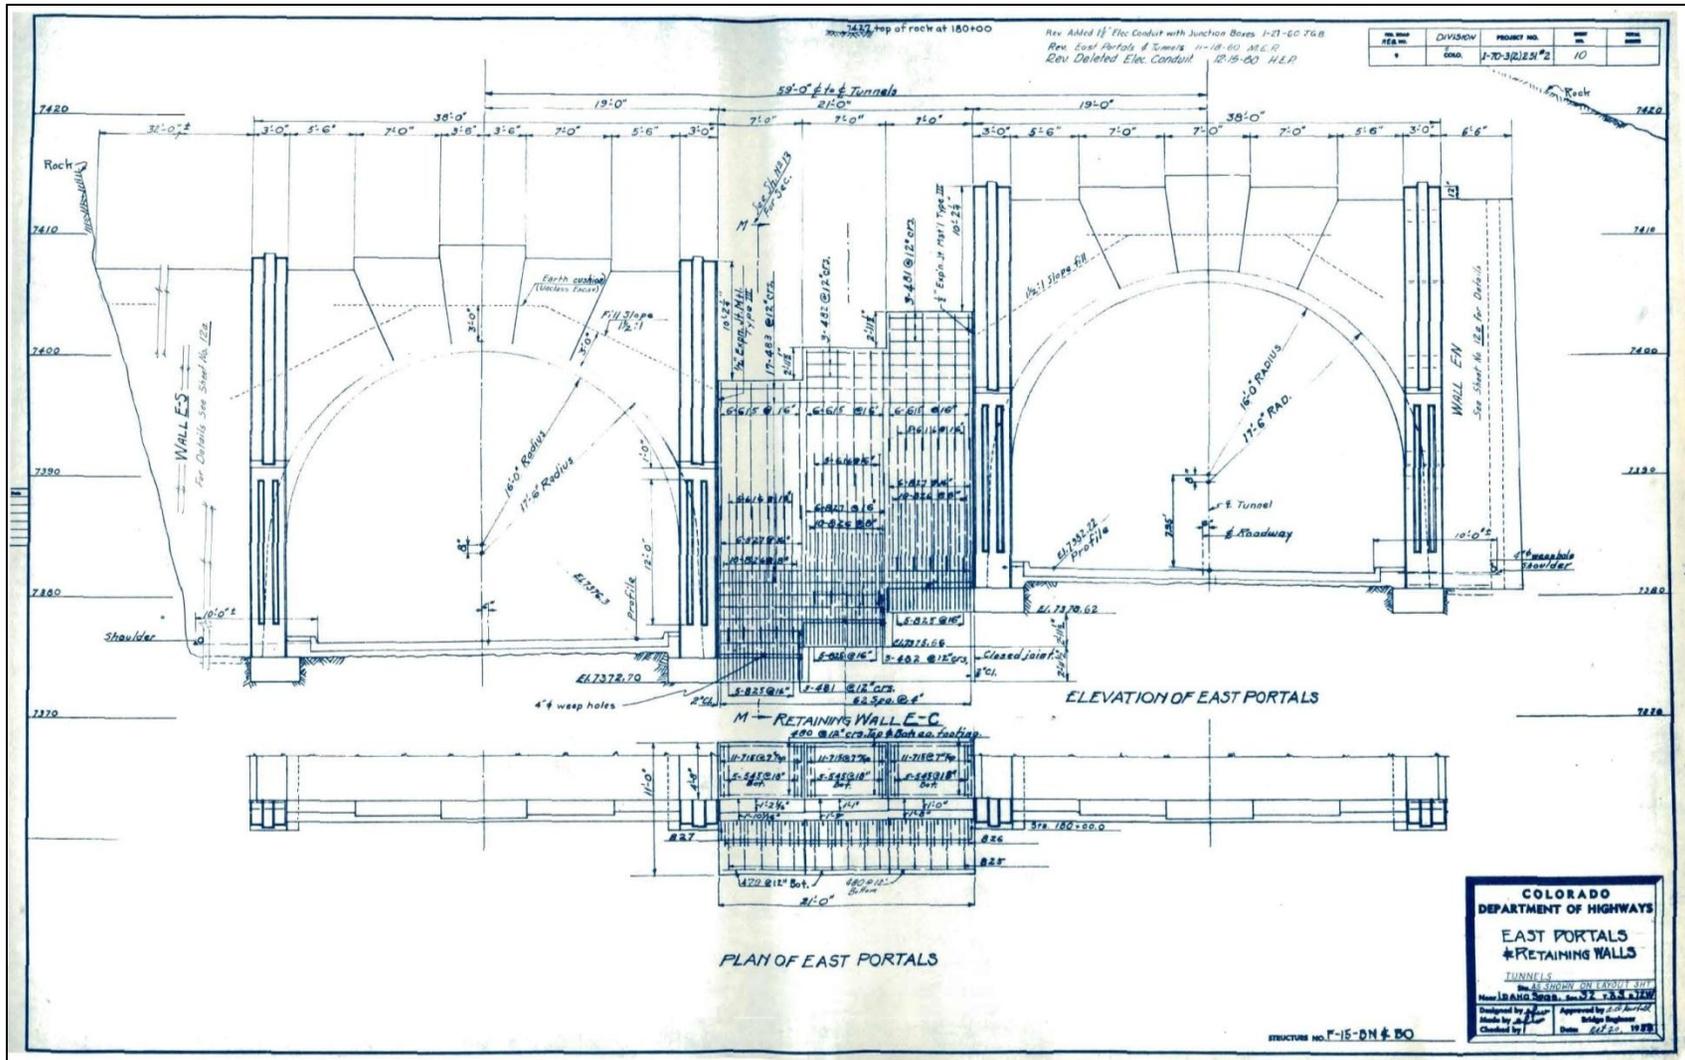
Twin Tunnels As Built Plans (Sheet 10). Details of east portals and retaining walls.
